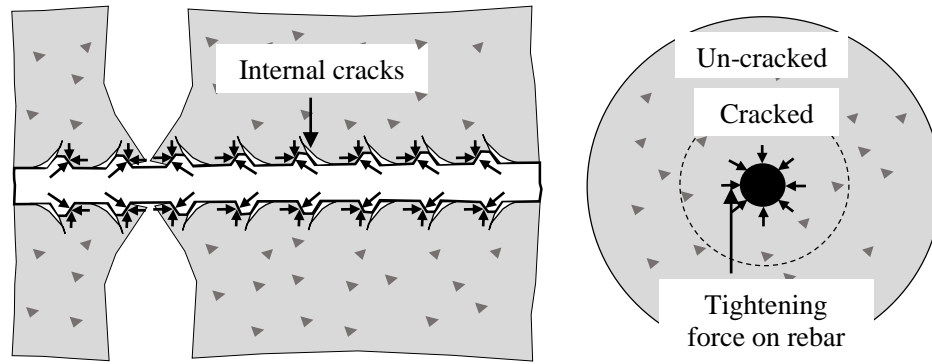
Internal cracks around deformed rebar [5].
